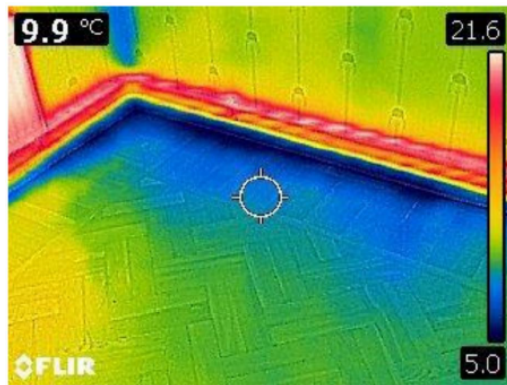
Heat loss at the wall-floor junction on the ground floor – Image © OAMK
